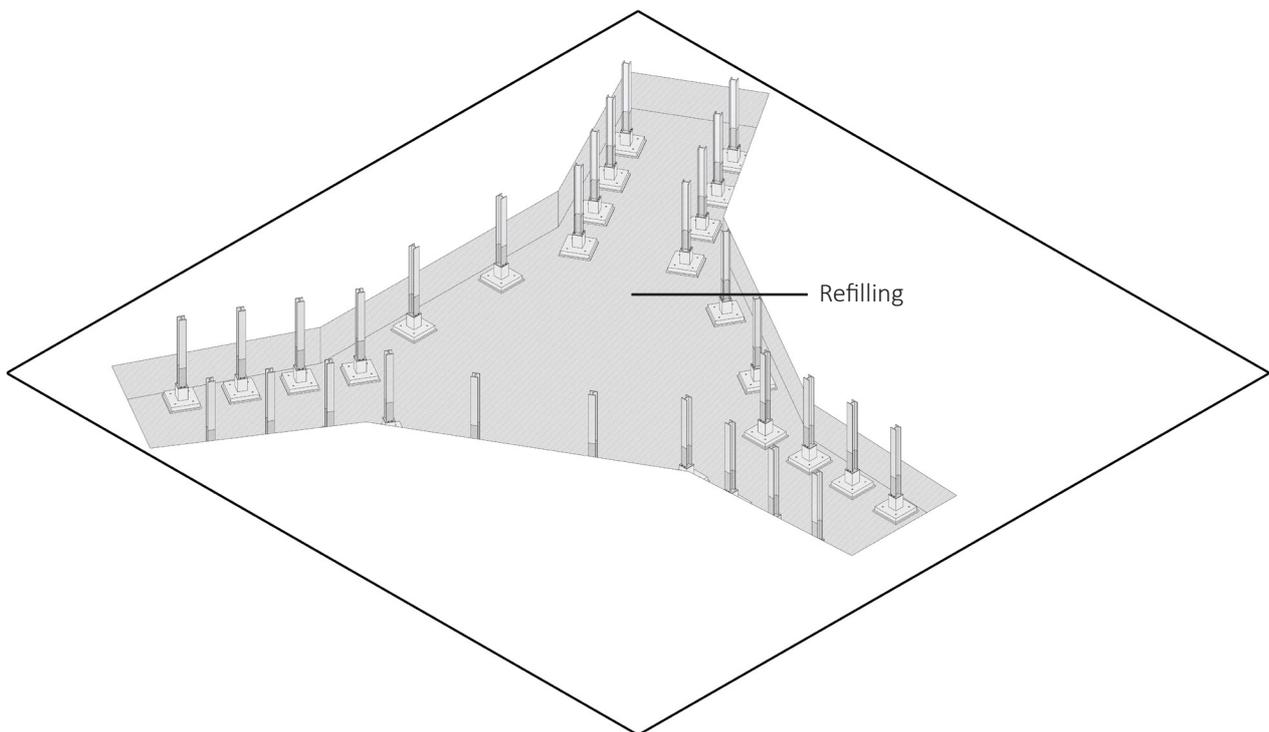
Foundation layout. Shallow foundation is applied to the station. Original author
